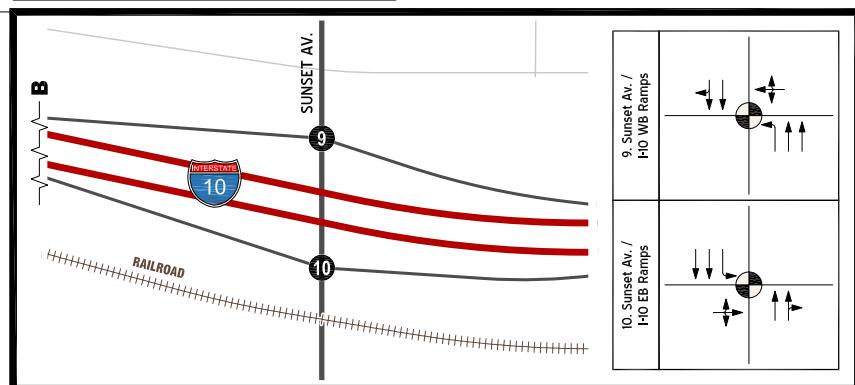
ALTERNATIVE 1 (EXISTING CONFIGURATION) INTERSECTION TRAFFIC CONTROLS AND APPROACH LANES
